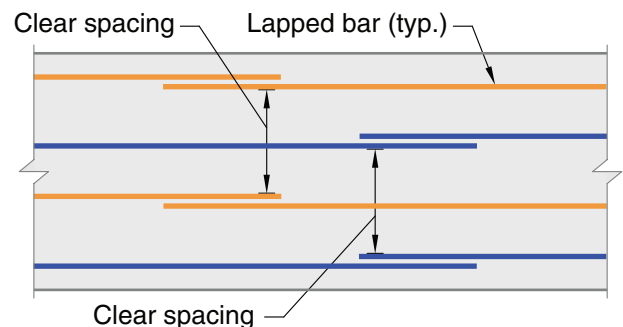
Clear spacing of lap-spliced bars for determination of ℓ_d for staggered splices.
